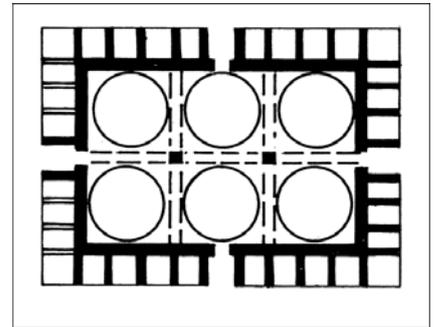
Floor plan of the *bedesten* (plan M. Harbova)
